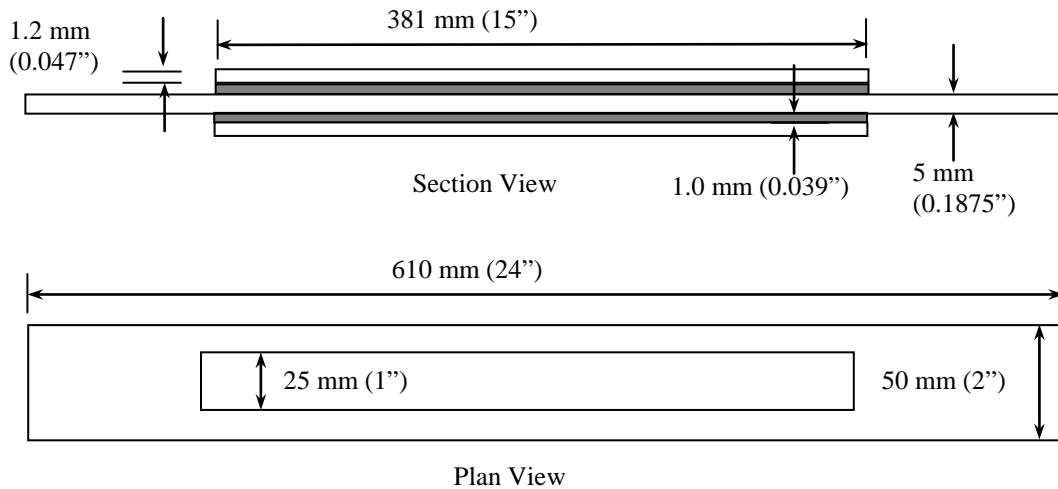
Doubly Reinforced Steel Plate Specimen Dimensions
